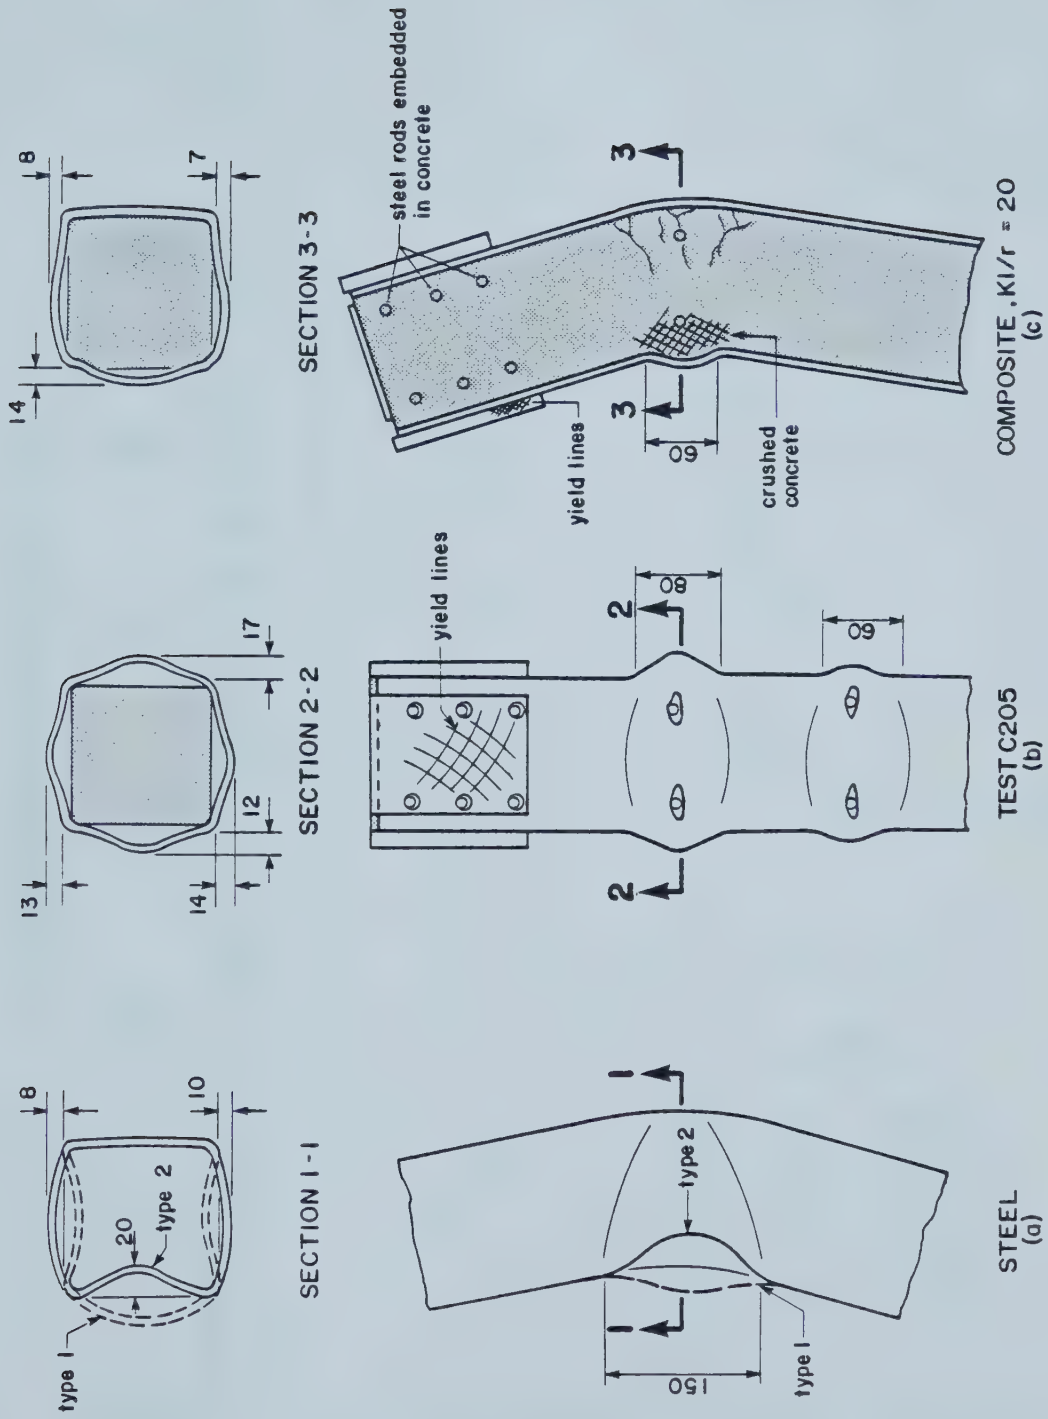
Typical Failure Modes for Beam Column Tests
